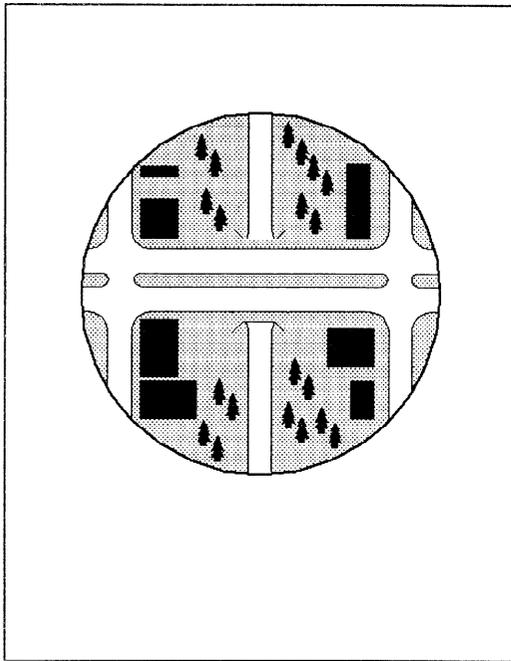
A Brunnel at the crossing of a single and dual carriageway road
